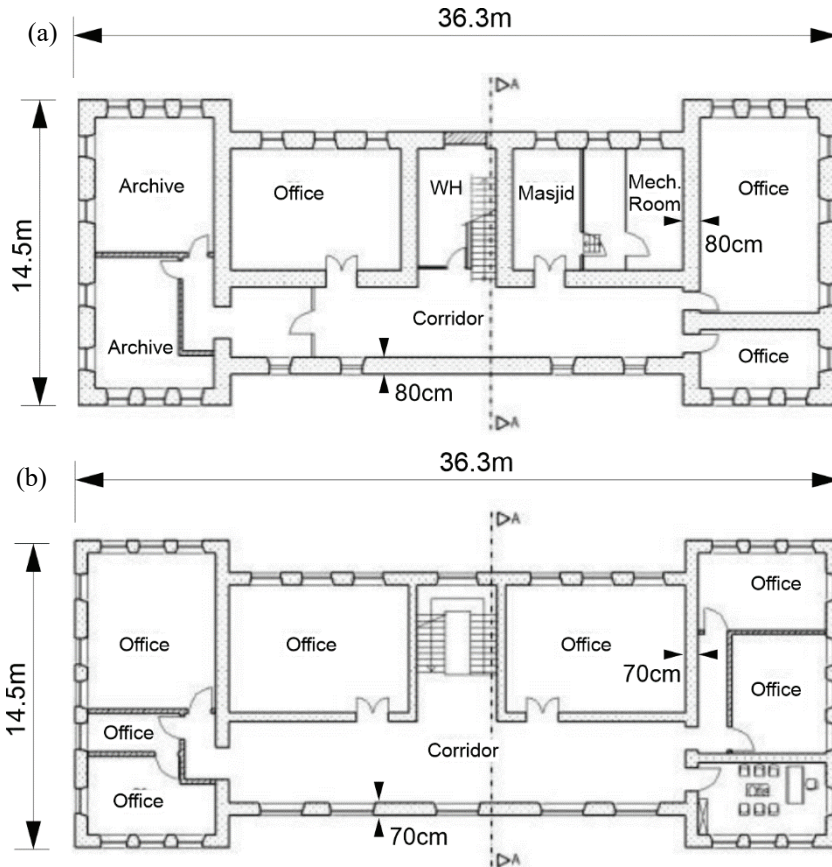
(a) Basement and (b) first-floor plan drawings of the building [22]
